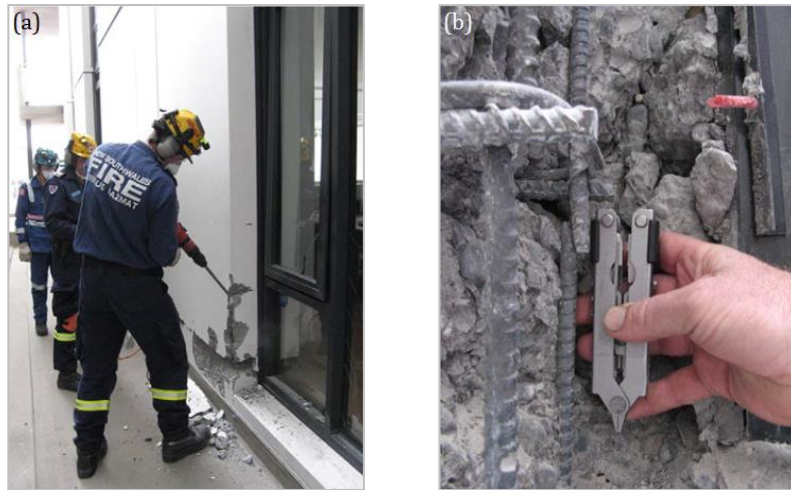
Fracturing of wall reinforcement in the Gallery Apartments building during the Canterbury earthquakes: (a) small crack at the base of the wall, (b) fracture of longitudinal bars is revealed after concrete removal (Sritharan et al., 2014)
